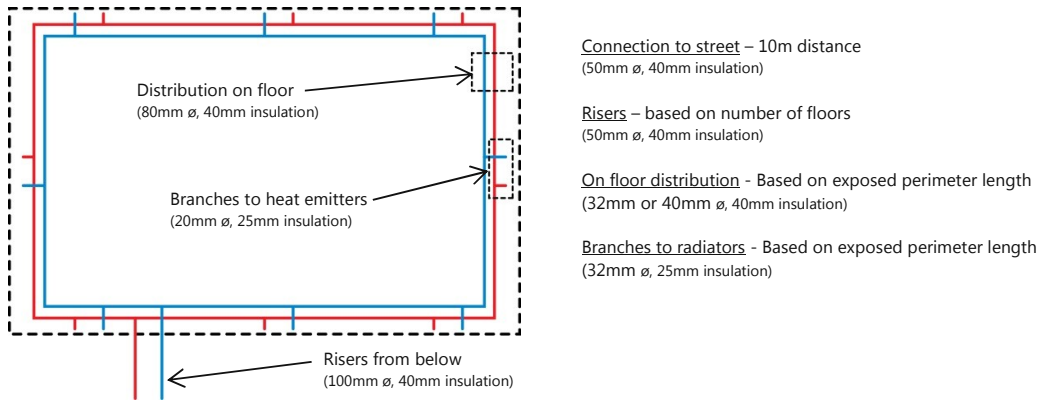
Schematic of different pipe types for a typical commercial floor layout.
